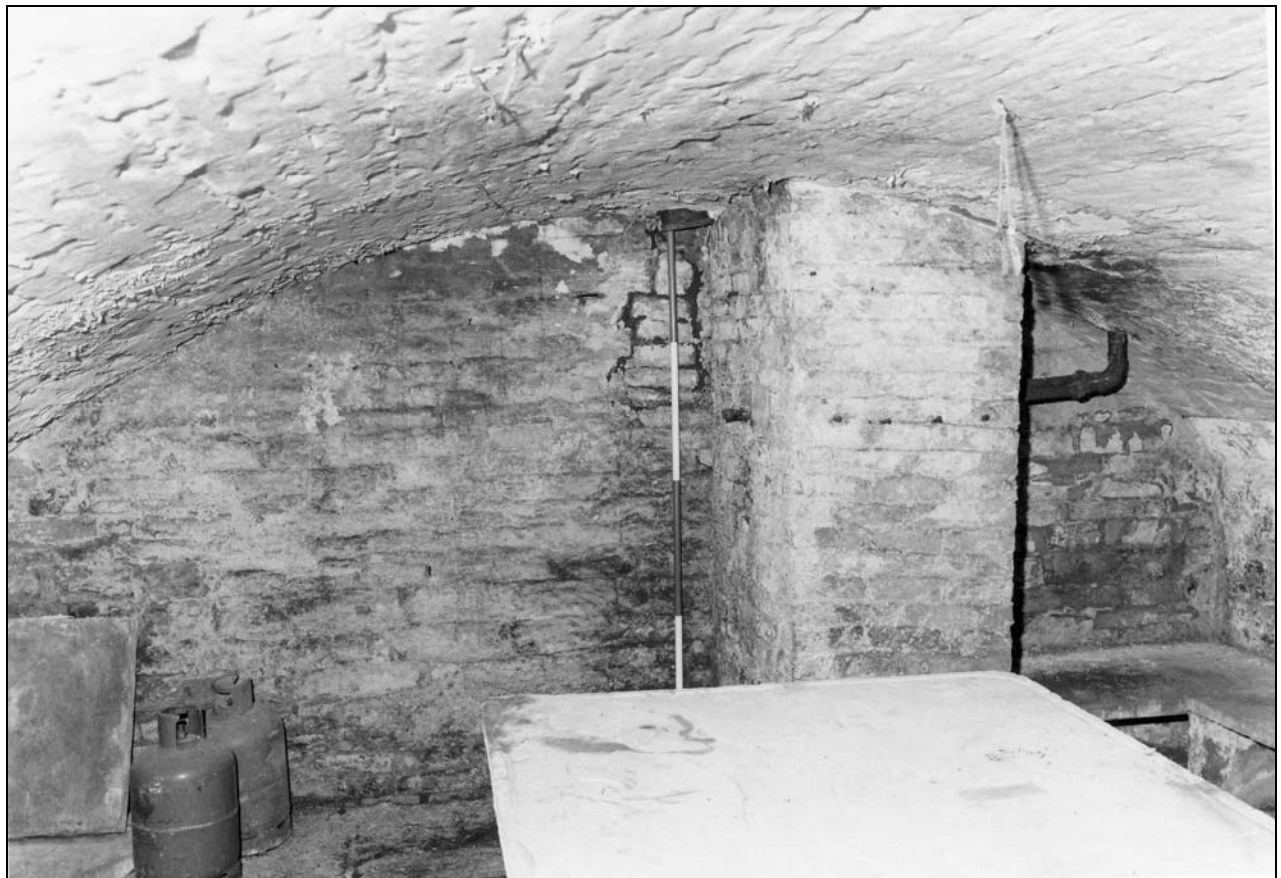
North wing: cellar B01, from the south (film 1, frame 14)
